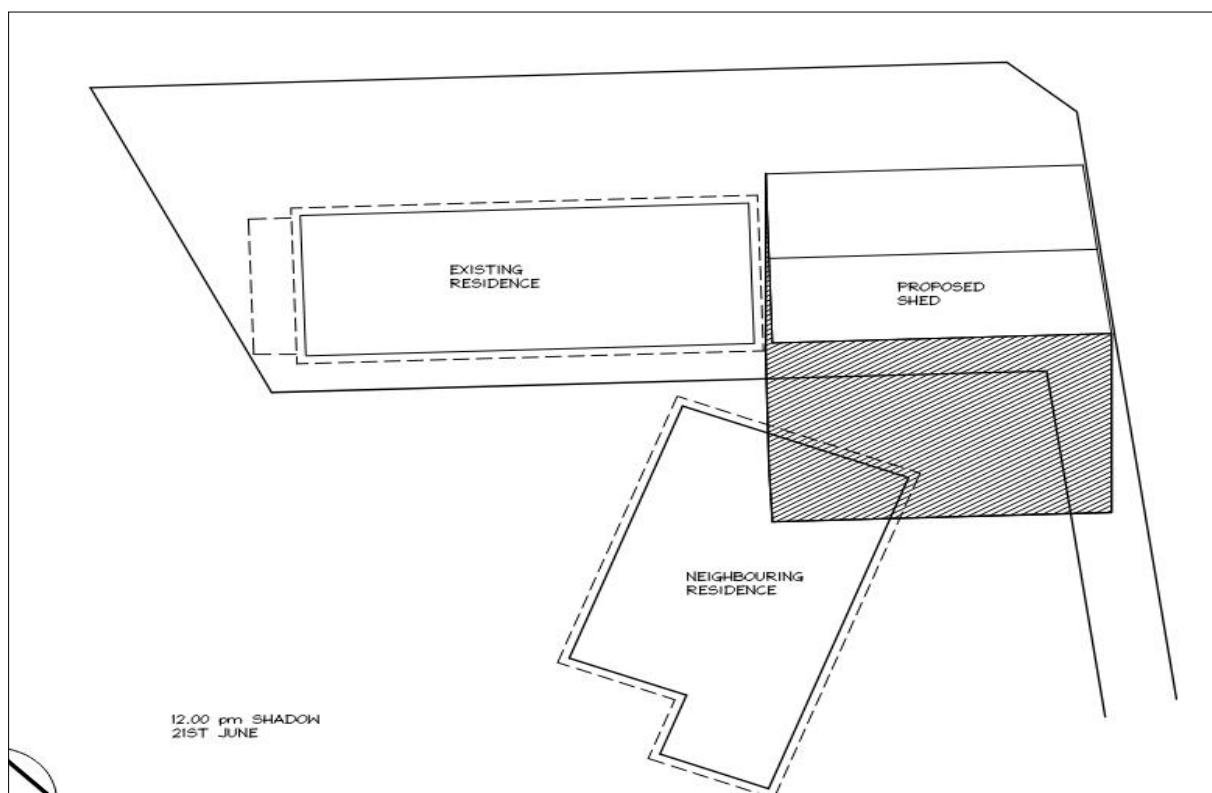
12 noon shadow (Steven Penton Building Design, 2022)
